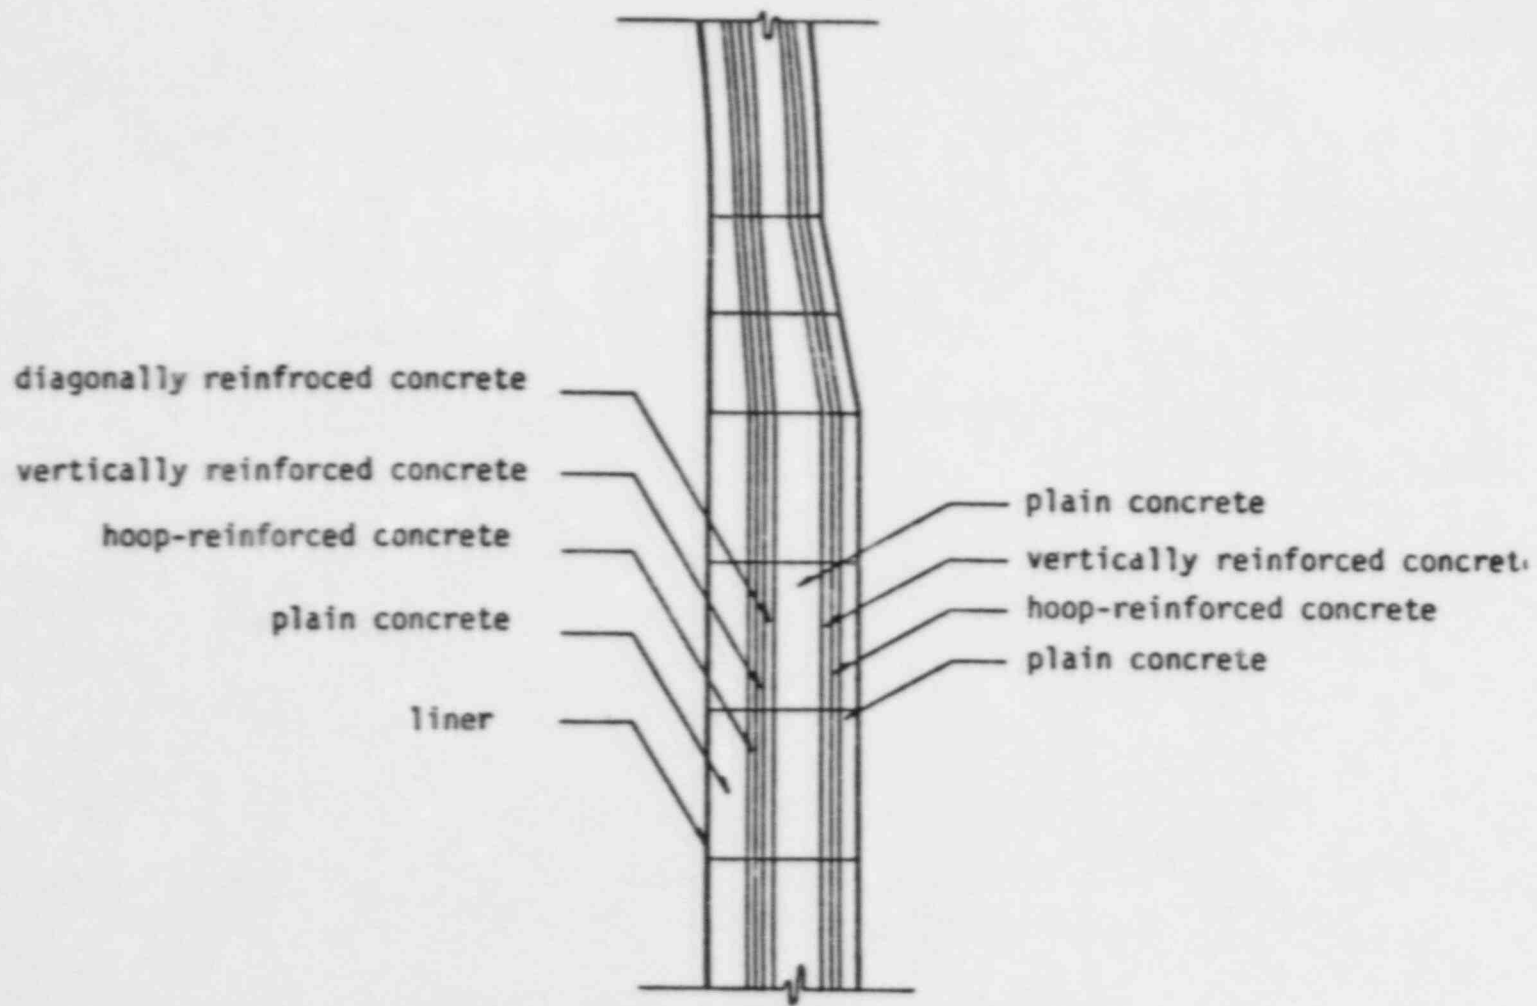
Different Element Layers in the Cylindrical Wall of the Containment
